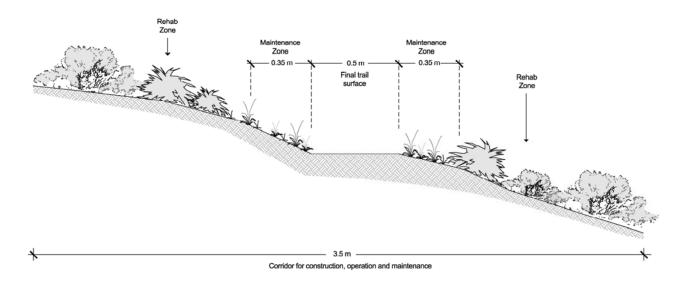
Typical cross section of the subject site for rock paving, nature/graving trail surface
